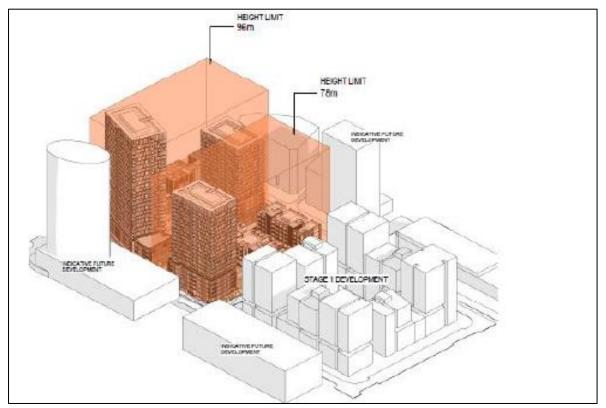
height plane study showing building elements against exhibited draft 2020 master plan heights
